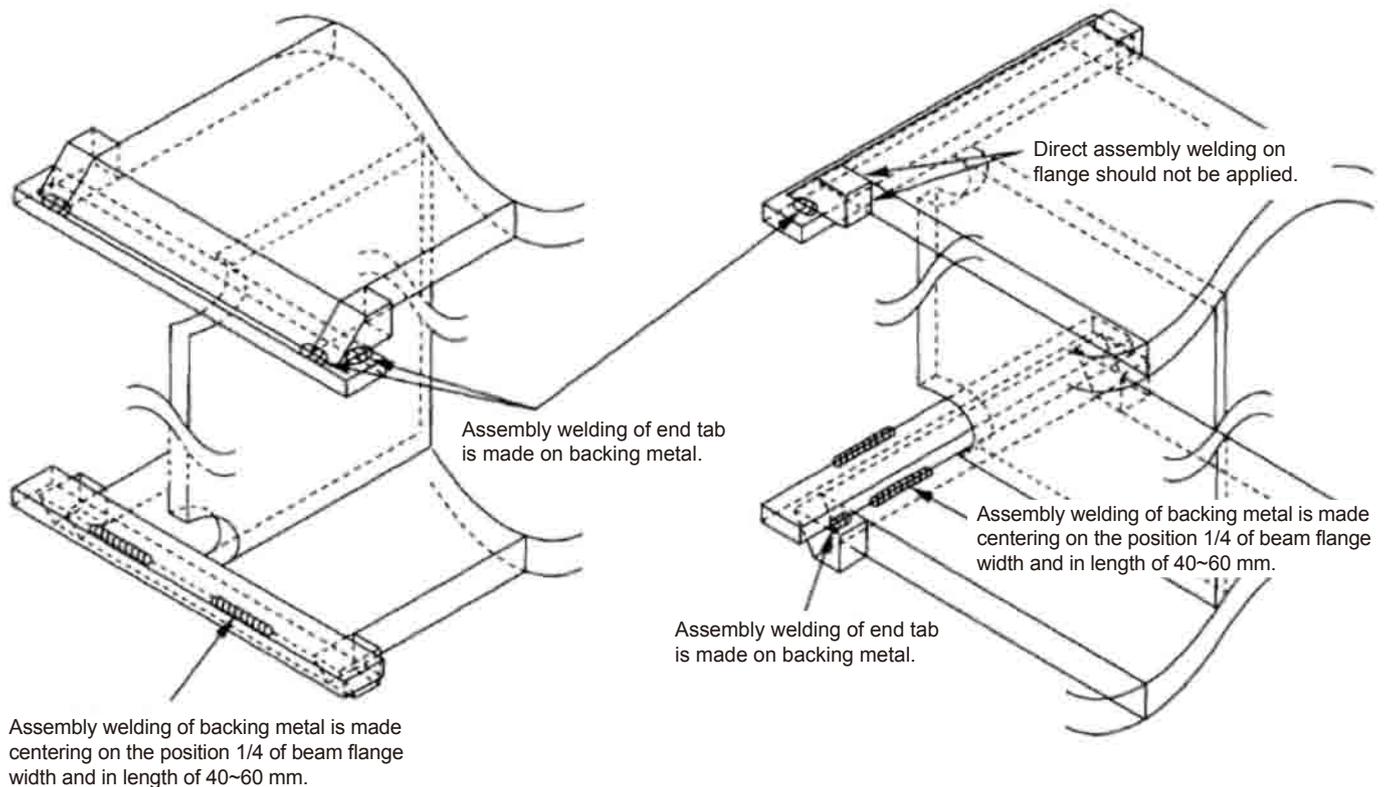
Shop Assembly of Backing Metal and End Tab²⁾
